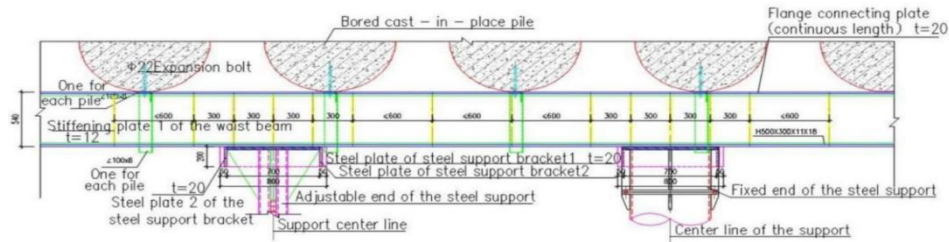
Plan Design Diagram of Steel Waist Beam (Cross - Brace Section)
